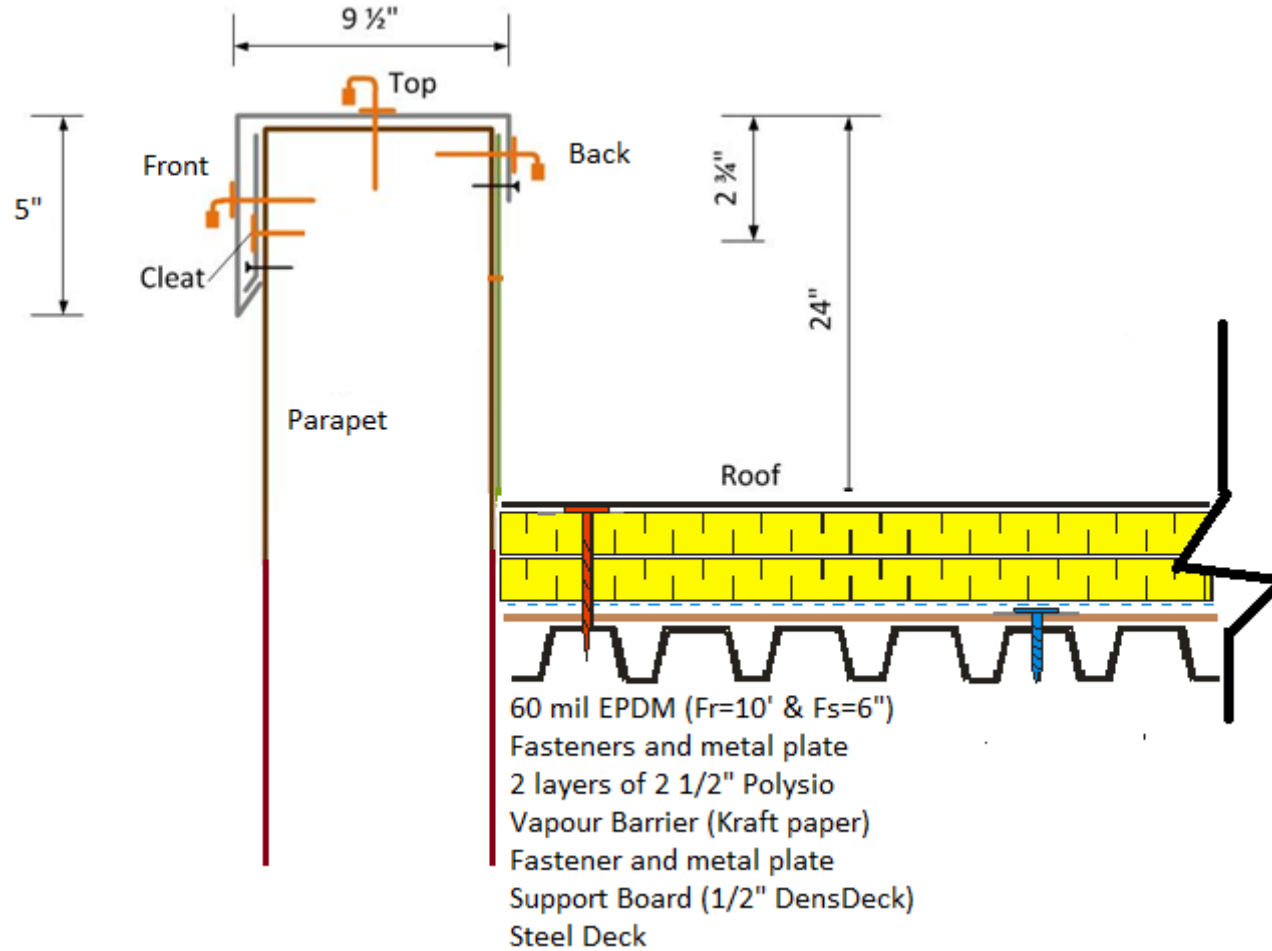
Roof edge, pressure tap profile layout, and roof detail
